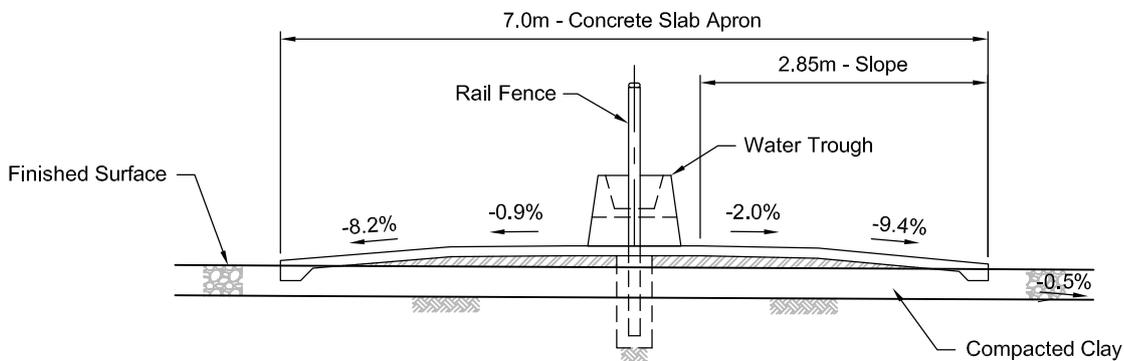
Typical concrete apron cross section details with 0.5% cross slope in pen.
